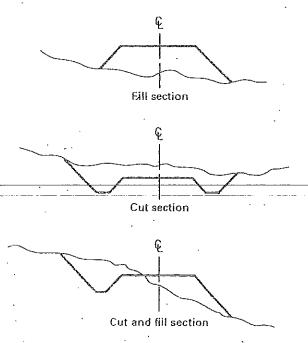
Original ground line and template sections. (Source: Paul H. Wright, Highway Engineering, Sixth Edition, John Wiley & Sons, 1996.)
